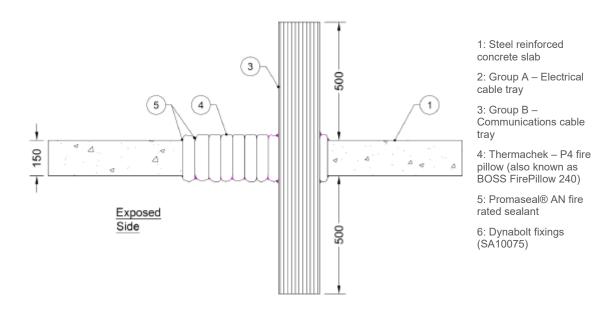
Section B-B of tested system in EWFA 39693400.1 with Thermacheck fire pillow (also known asBOSS FirePillow 240) arranged longitudinally protecting Group A and Group B cable penetrations
